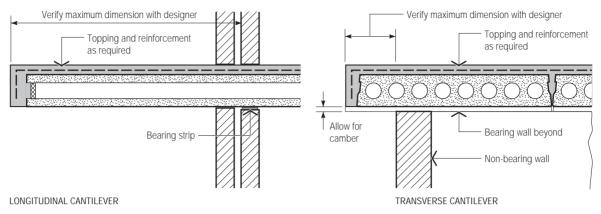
Longitudinal and Transverse Cantilever Arrangements
